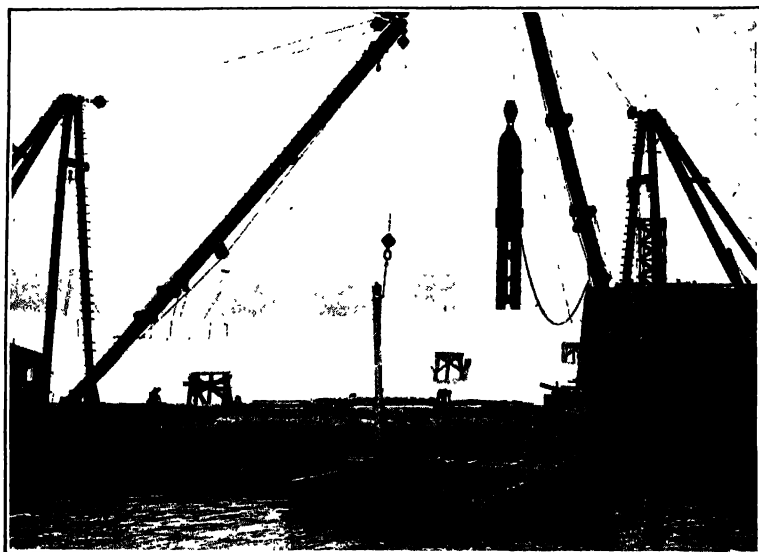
Floating derrick with hanging leads driving bridge foundation piles in a cofferdam.
